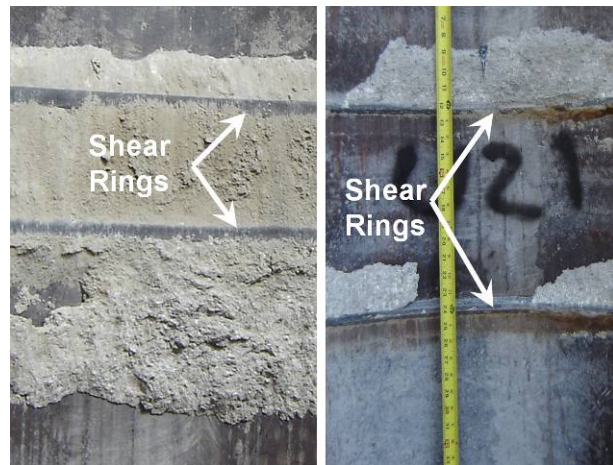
Comparison of the Failure of Reinforced Concrete at Shear Rings: Test Unit #19 with a Spacing of 76 mm (left) and Test Unit #21 with a Spacing of 305 mm (right)
